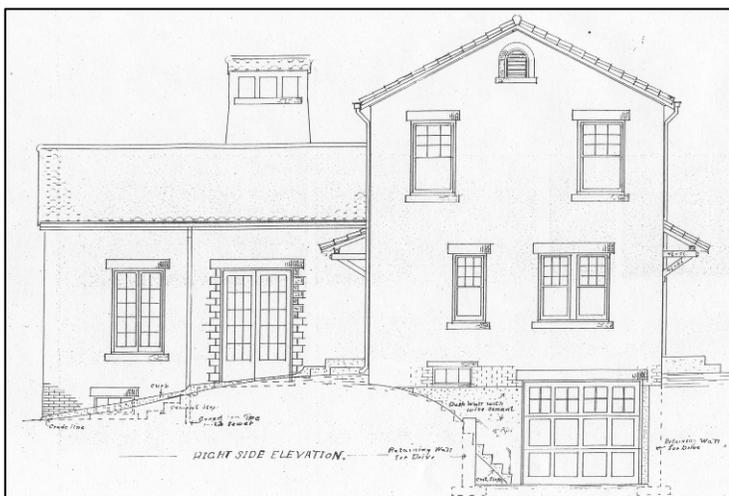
Architectural drawings for the Merle and Jeanette Gruben House, 305 3<sup>rd</sup> Street SE, 1933, unidentified architect or plan house (elevation drawings courtesy of Steven and Sarah Dobbs)
